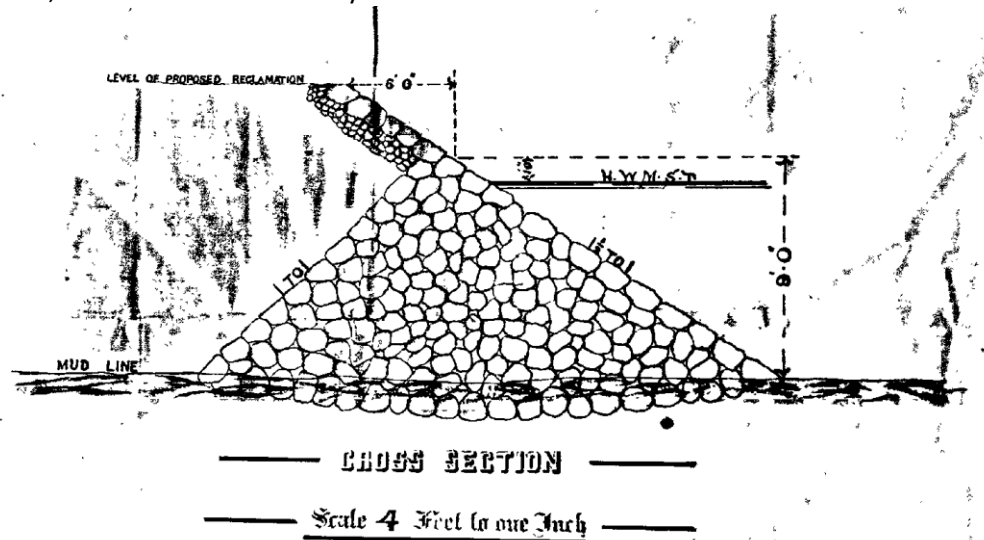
Cross section diagram of the rubble embankment (sea wall) at Freemans Bay from 1889.⁵⁸⁰
